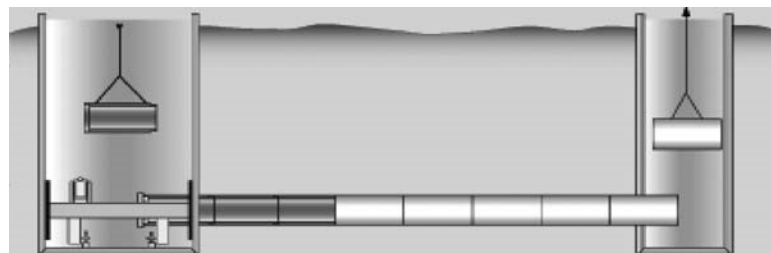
PTMT operation, step 3: Replace auger casing with product pipe. (Source: Bohrtec, 2008)
